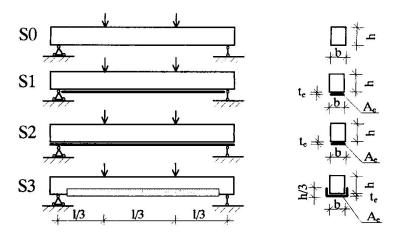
Diagrams of reinforcing of beams with external glued reinforcement
